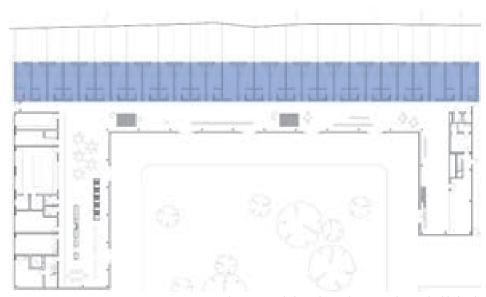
Spring Gardens: Ground Floor Plan with courtyard suites highlighted
